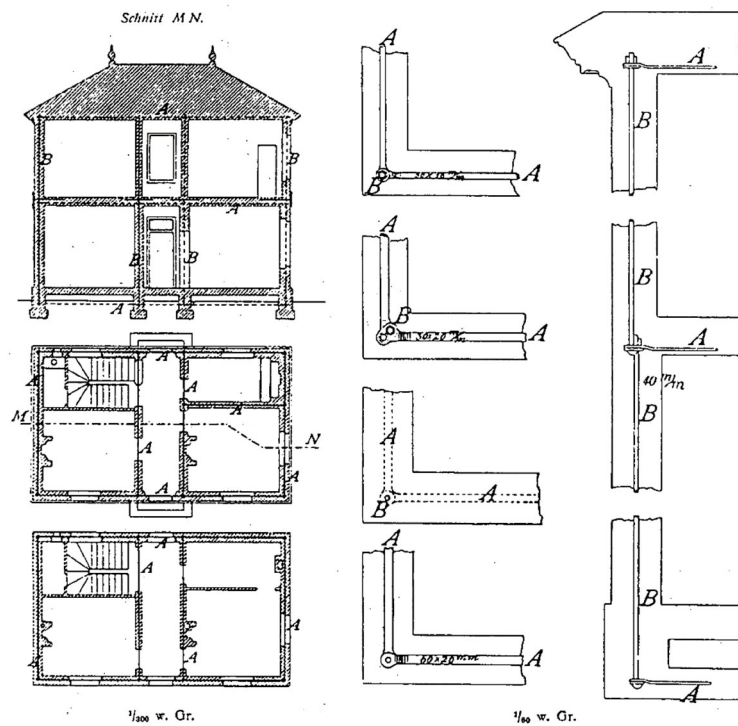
Illustration of J. Lescasse's Brick Construction Method (M.Horiuchi, 1997)
